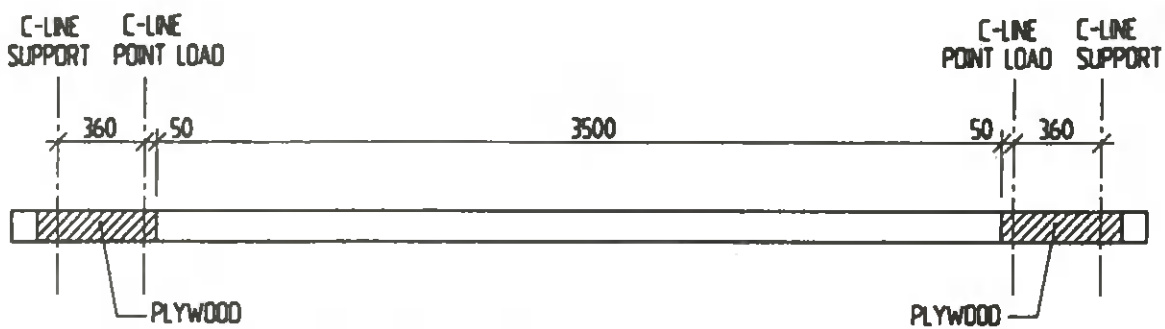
Test specimen reinforced with plywood. All sizes in mm.
